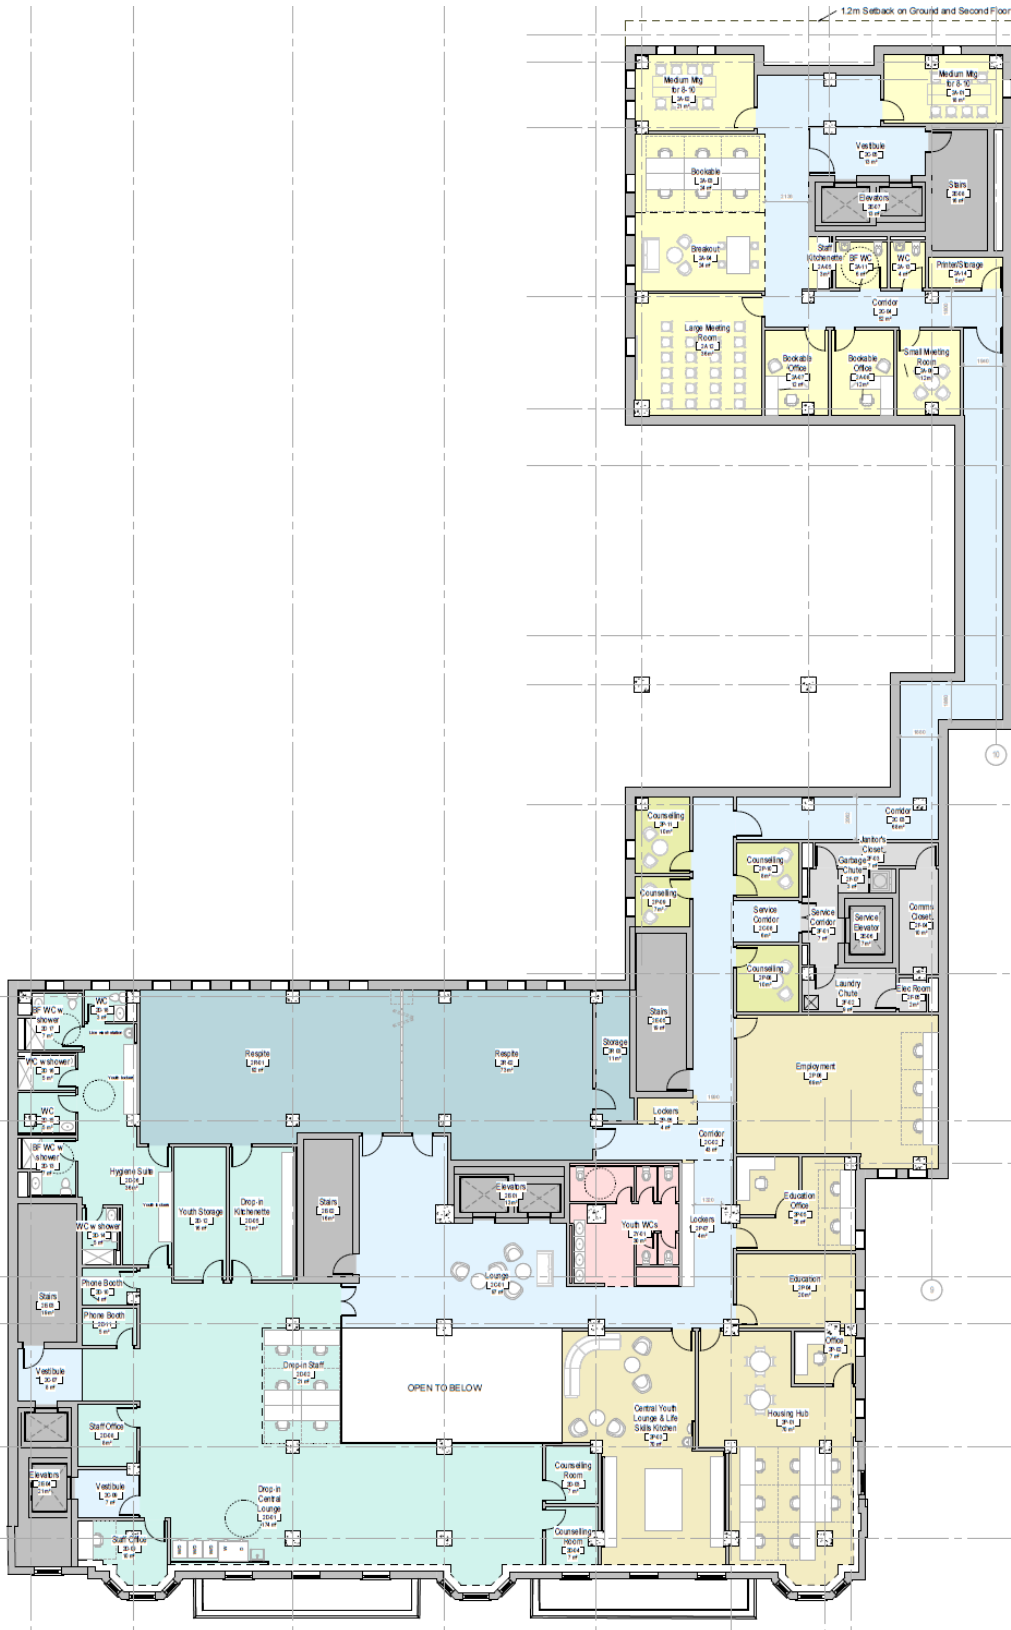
Level 2 floor plan for 20 Gerrard Street East included for illustration purposes (ERA Architects Inc. & Hilditch Architects Inc., March 3, 2026).
